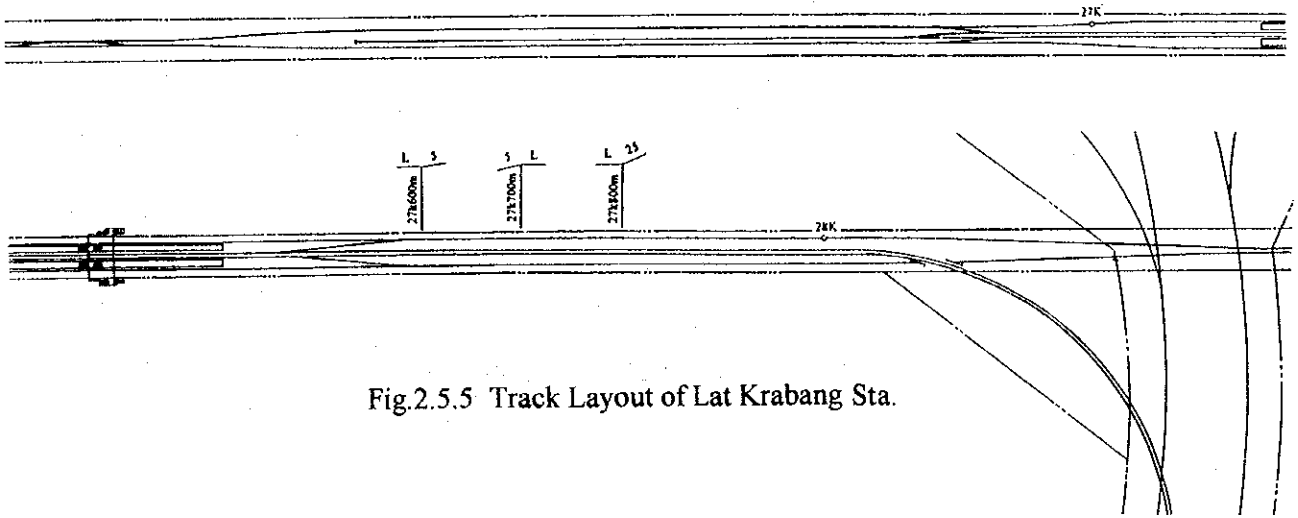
Track Layout of Lat Krabang Sta.
